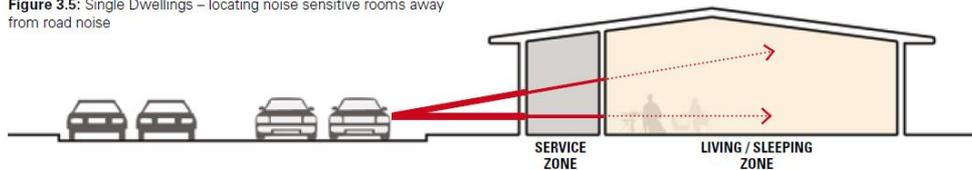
Sample of building layout strategies 1(NSW DoP, 2008)
